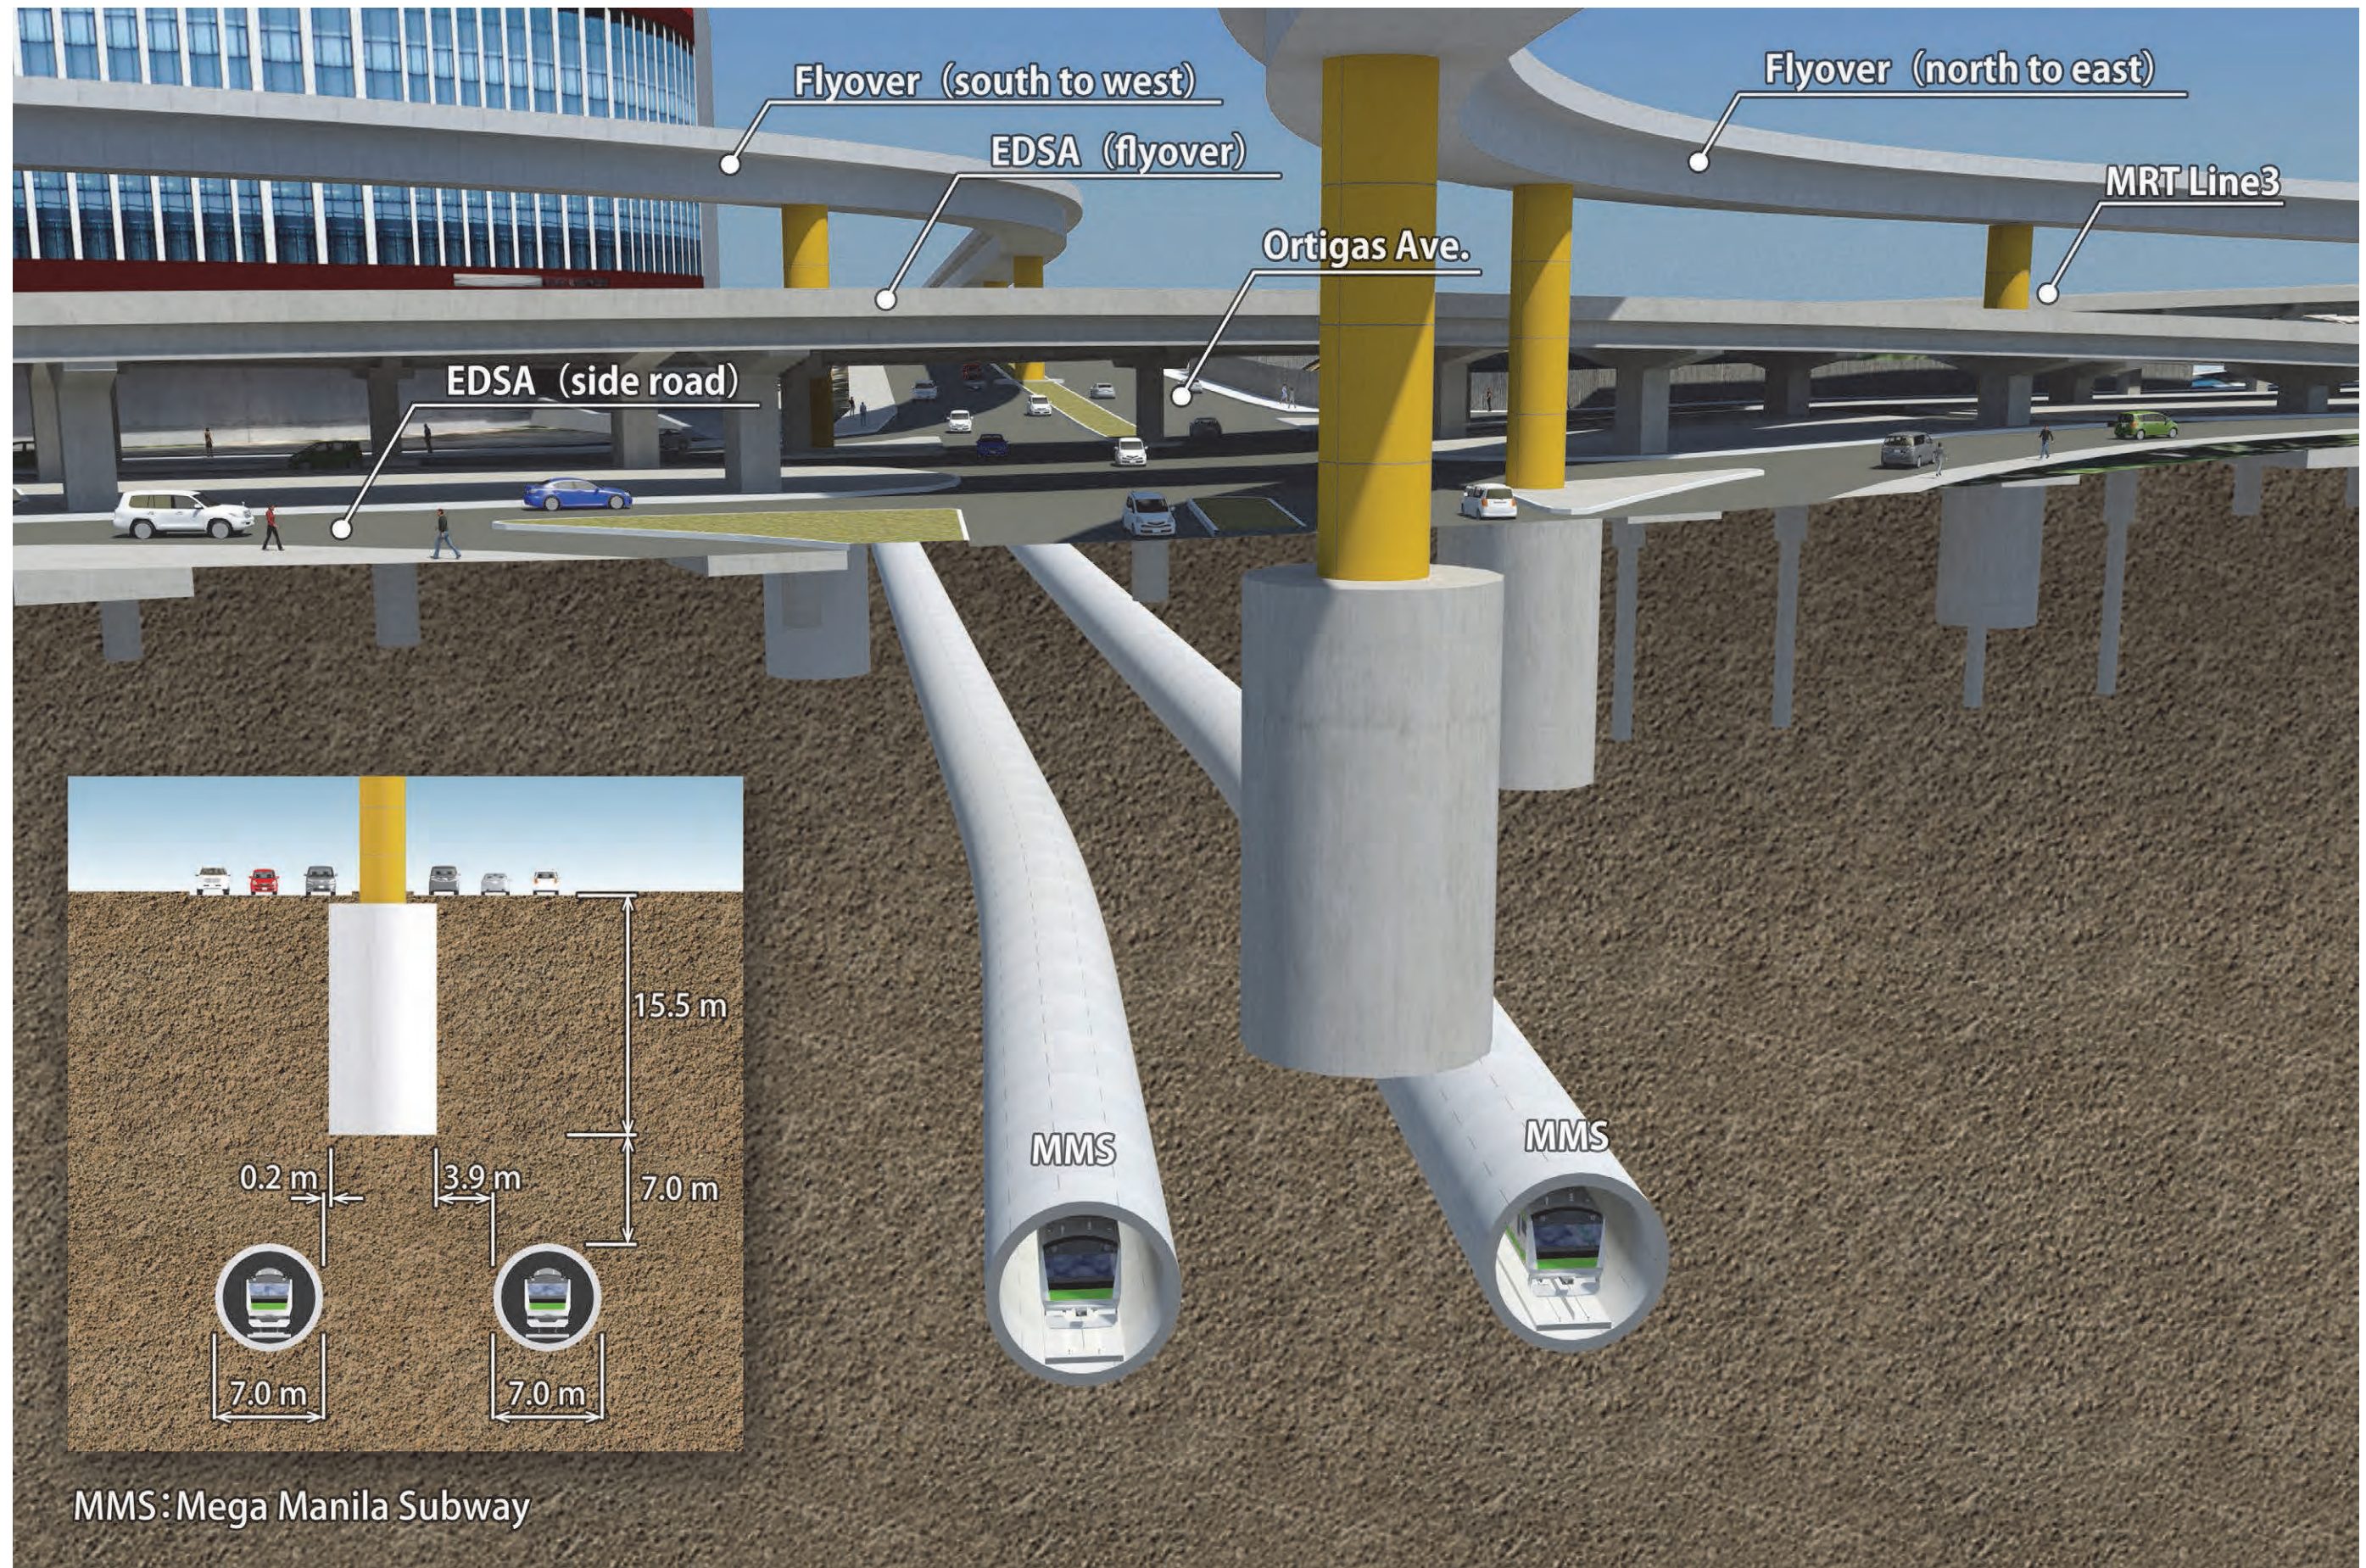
Typical Underground Structure requiring Neighboring Construction (EDSA and Ortigas Avenue – Option 2 in Central Zone)
